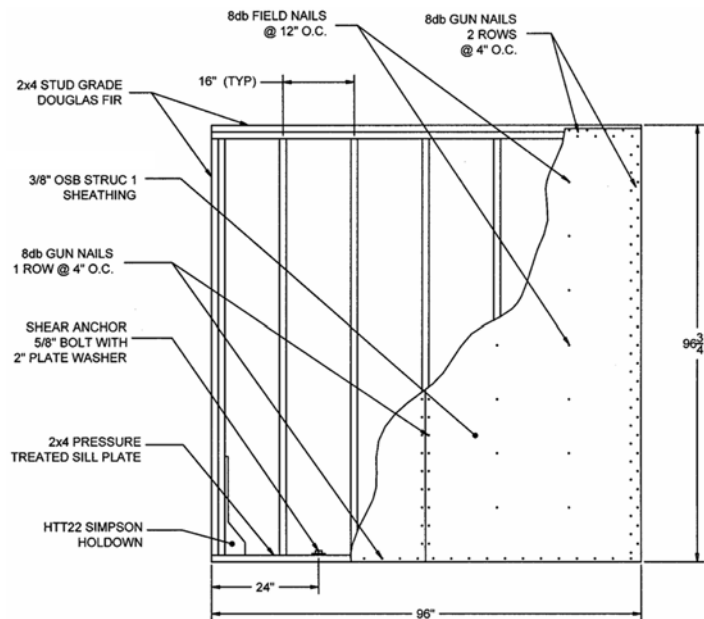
Baseline shearwall (BW1) configuration (from: Gatto and Uang 2001) [Note: 1 in. = 25.4 mm]
